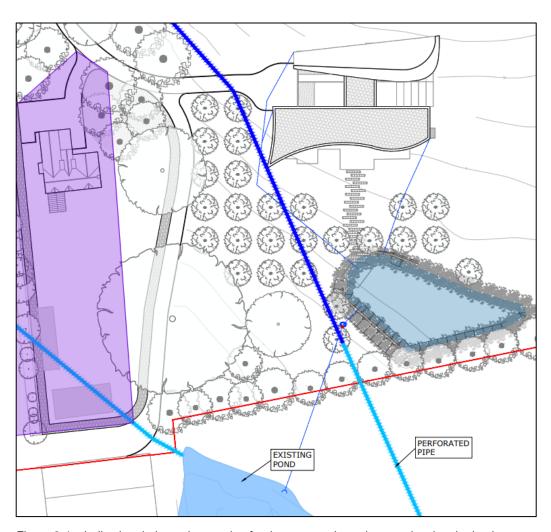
Indicative drainage layout plan for the proposed new house, showing the basin.
